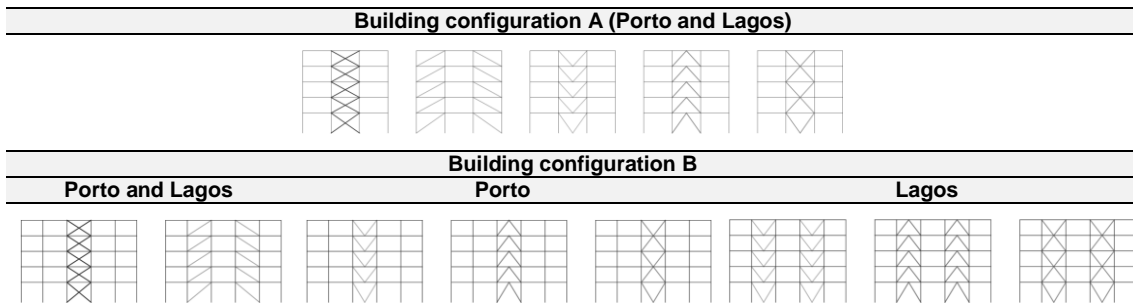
CBF configurations adopted for each seismic location and building configuration.
